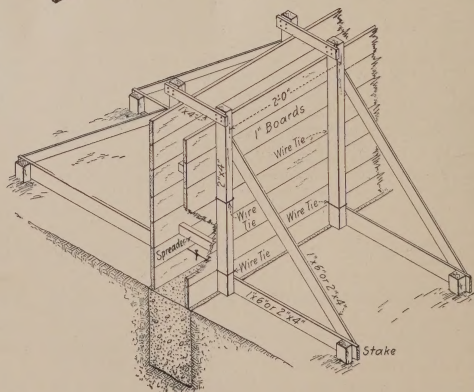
Wall form for small structure such as garage where foundation wall is poured in trench dug in the ground.
